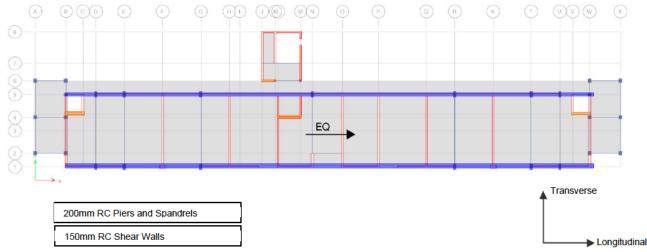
for a plan view showing the lateral load resisting elements in the longitudinal direction.
